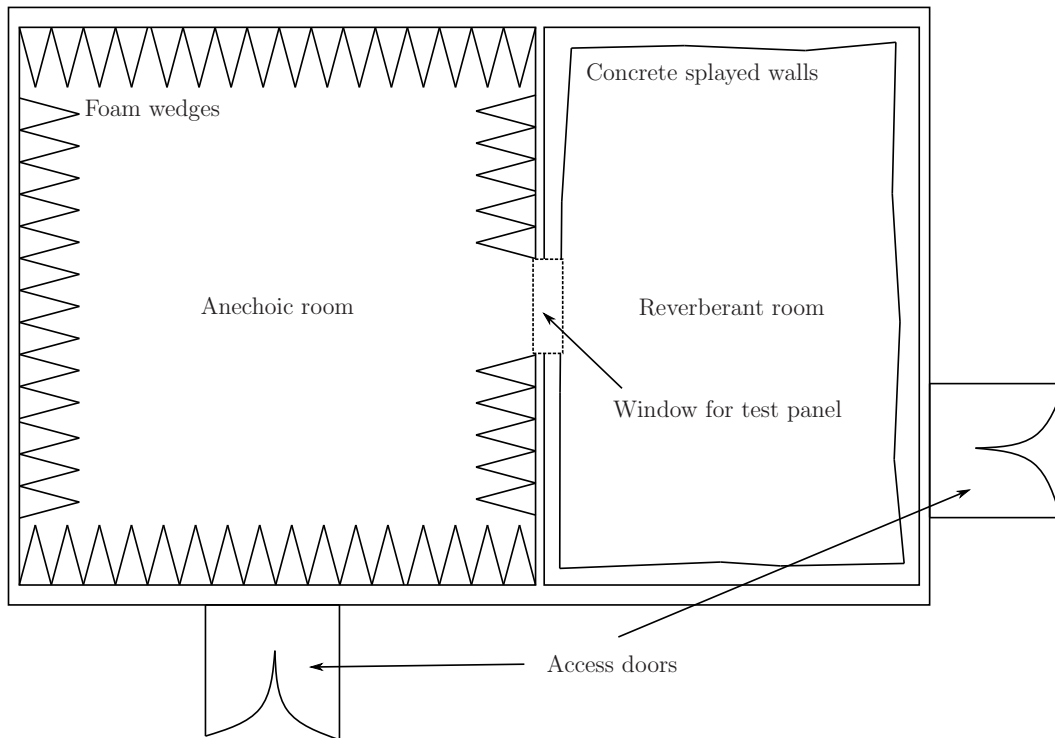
Floorplan of the structural acoustics loads and transmission facility at NASA Langley.
